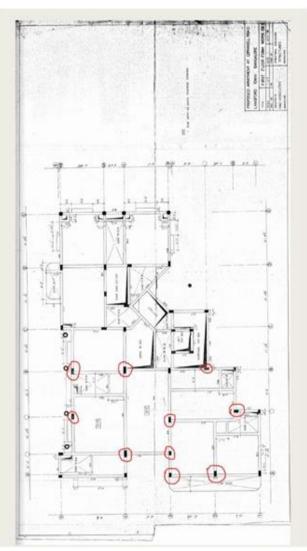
Basement Layout plan indicating Columns that were tested for strength evaluation.
